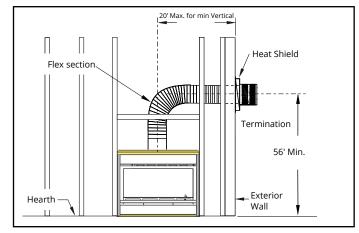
b 5"/10"Top Vented, wall mounted installation with one 90° bend. The vent run must comply with Venting Graph for Top vent, wall mounted terminations, Figure 12
